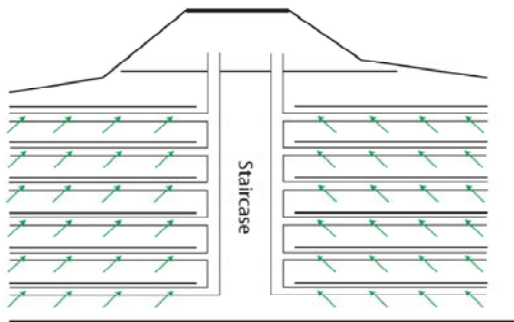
Schematic representation of internal ducting and undefined void under the roof
